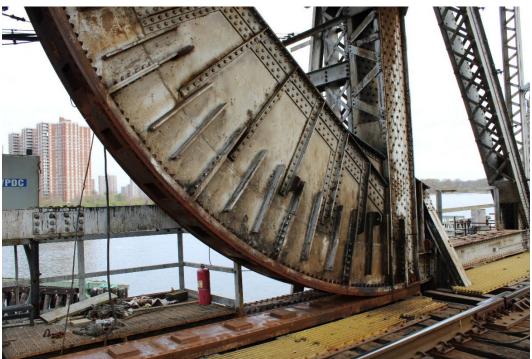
View of Amtrak Pelham Bay Bridge looking northeast (4/20/22)
